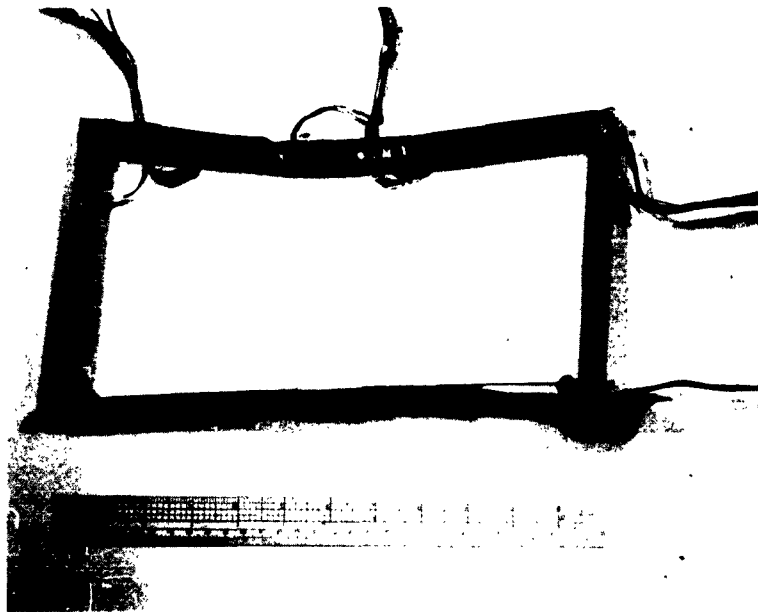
MODEL FRAME SHOWING A LATERAL SWAY FAILURE INITIATED BY LOCAL BUCKLING OF THE TOP FLANGE AT LARGE DEFORMATION DUE TO BENDING.
